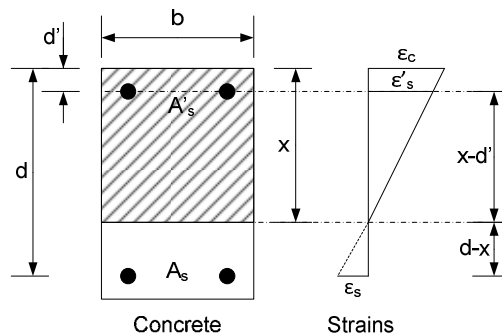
The Reinforced Concrete Section (Kong and Evans, 1987).
